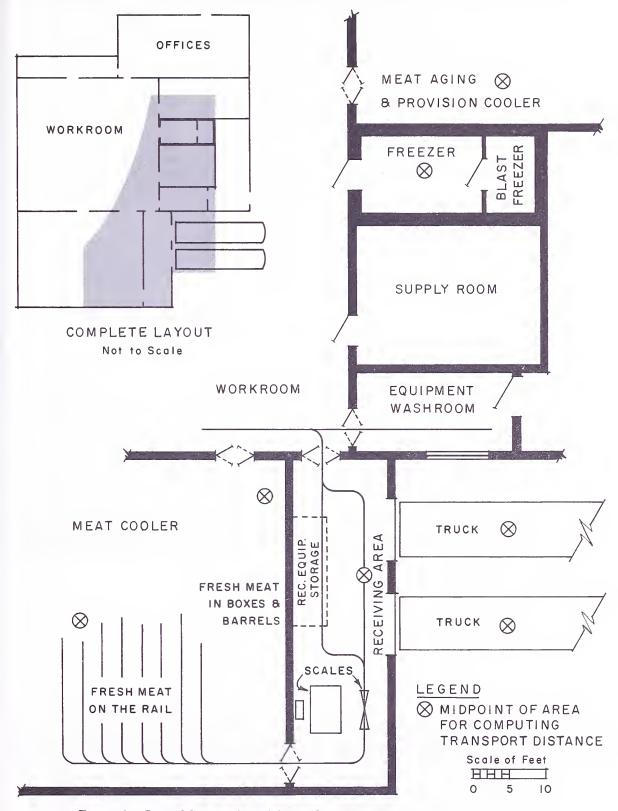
General layout of receiving and storage areas in a custom service house.
